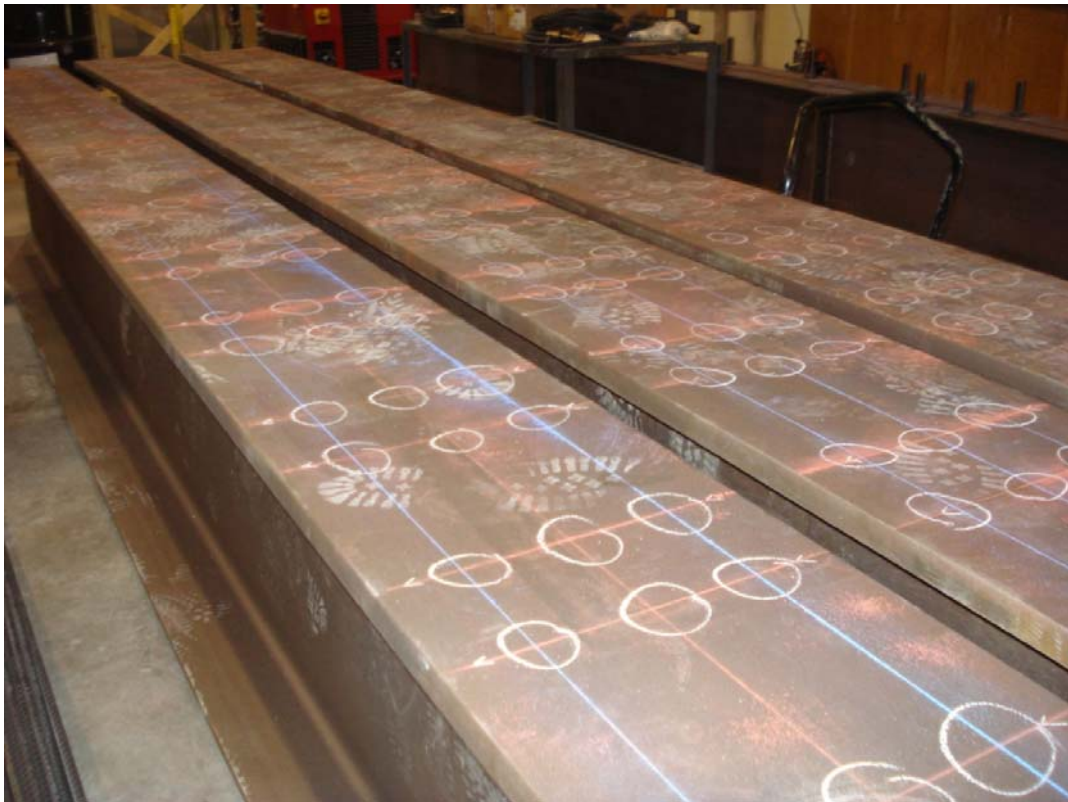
Girder Top Flange Prepared for Shear Connector Placement
